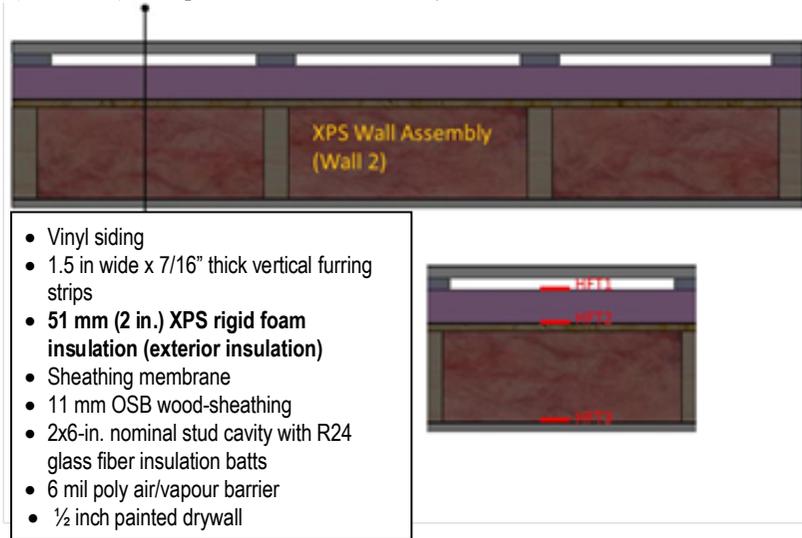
Wall 2 (W2: XPS) - Horizontal cross-section through XPS wall assembly showing locations of Heat Flux Transducers (HFT)
